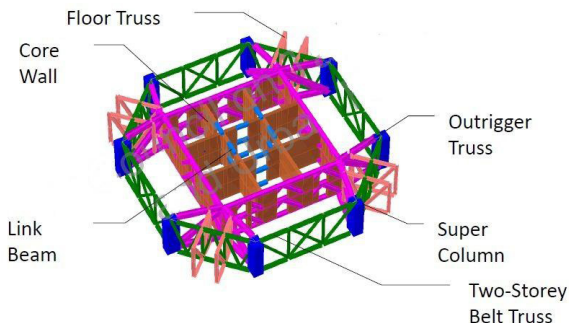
Core wall+ Supercolumn+ Outrigger truss+ Belt module of Signature tower
